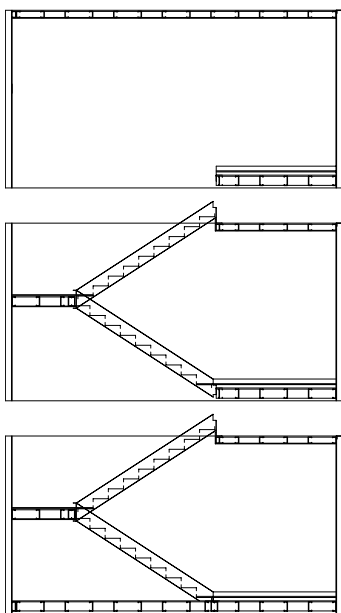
Detail of light steel modular stair system showing use of a 'false' landing to modules
